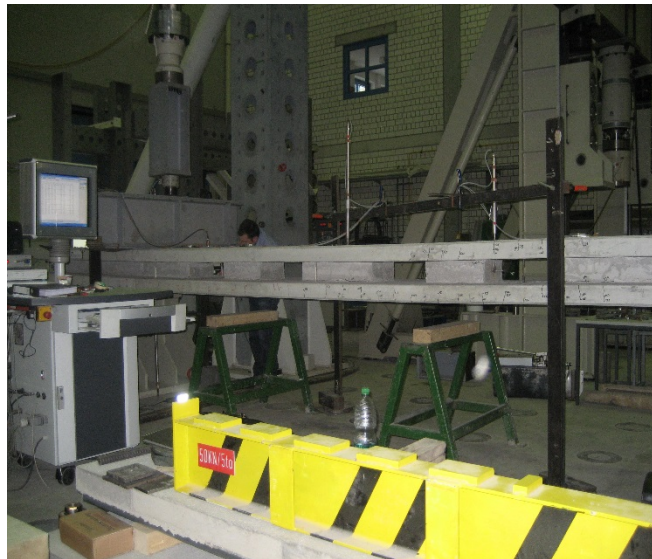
Load tests performed on a metal plate strip with sandwich cross-section and the larger web openings
